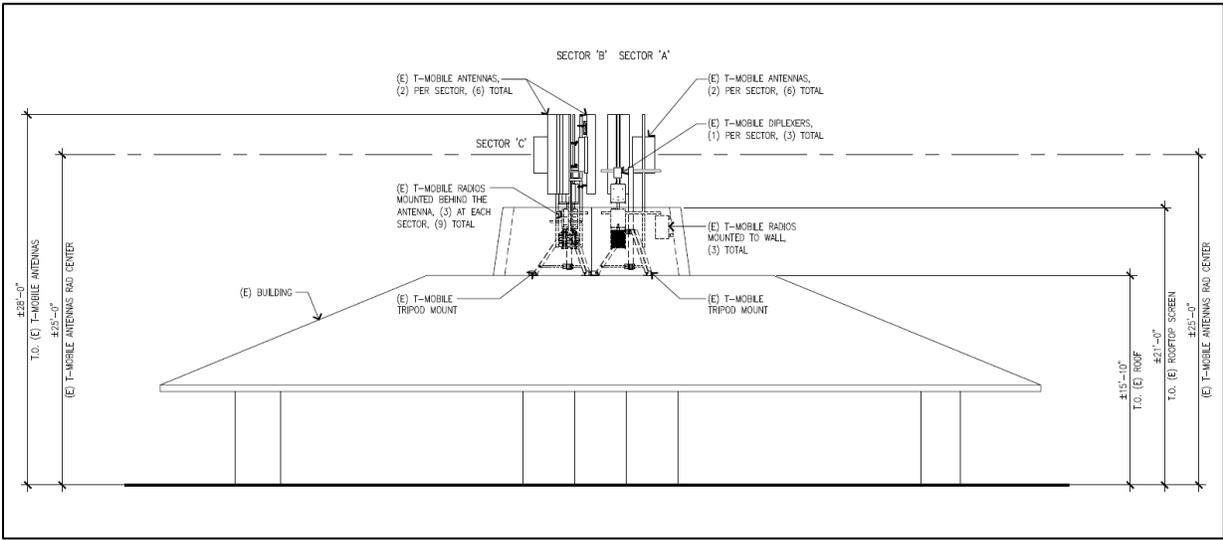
West elevation view of T-Mobile's antennas (Source: Plans, Page A-3, panel 2).
